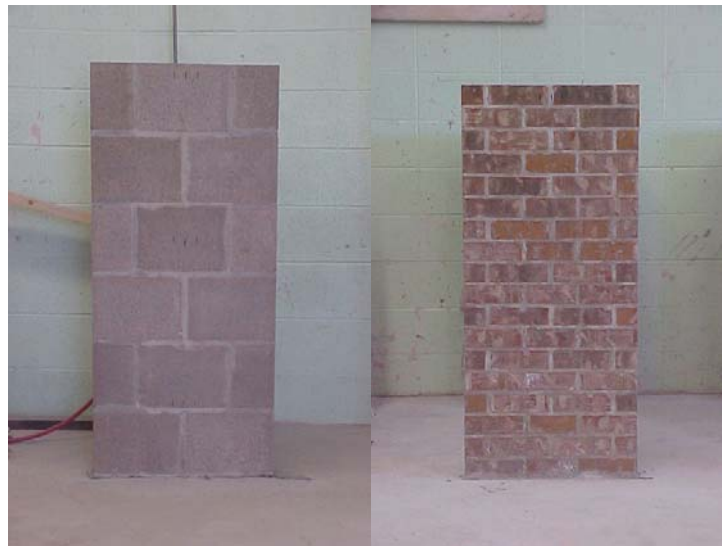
b *Masonry Units: concrete blocks (left), dark clay bricks (right)
